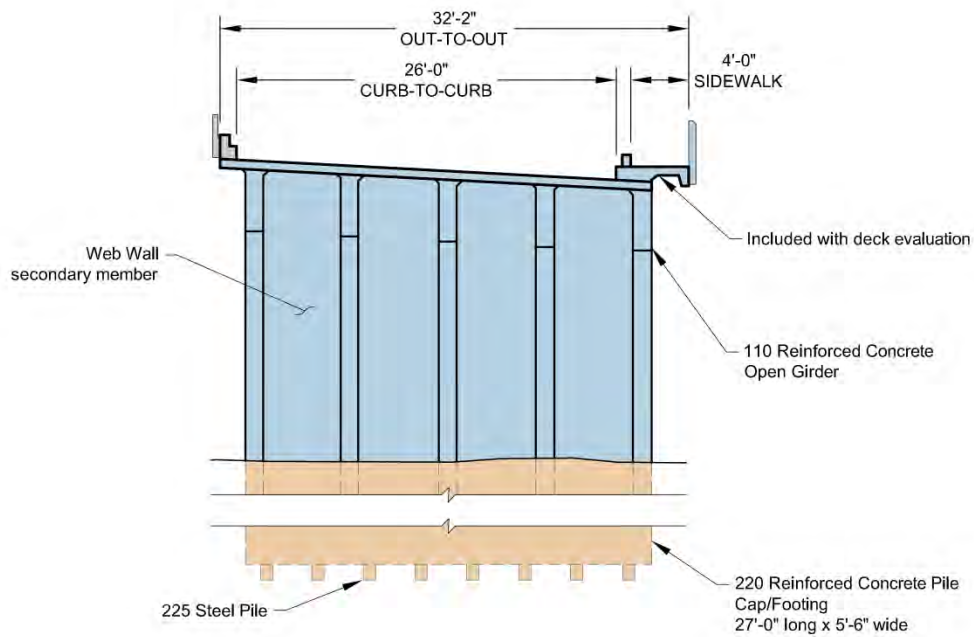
EI.24.4- 3: Cross section of superstructure near centerline pier
